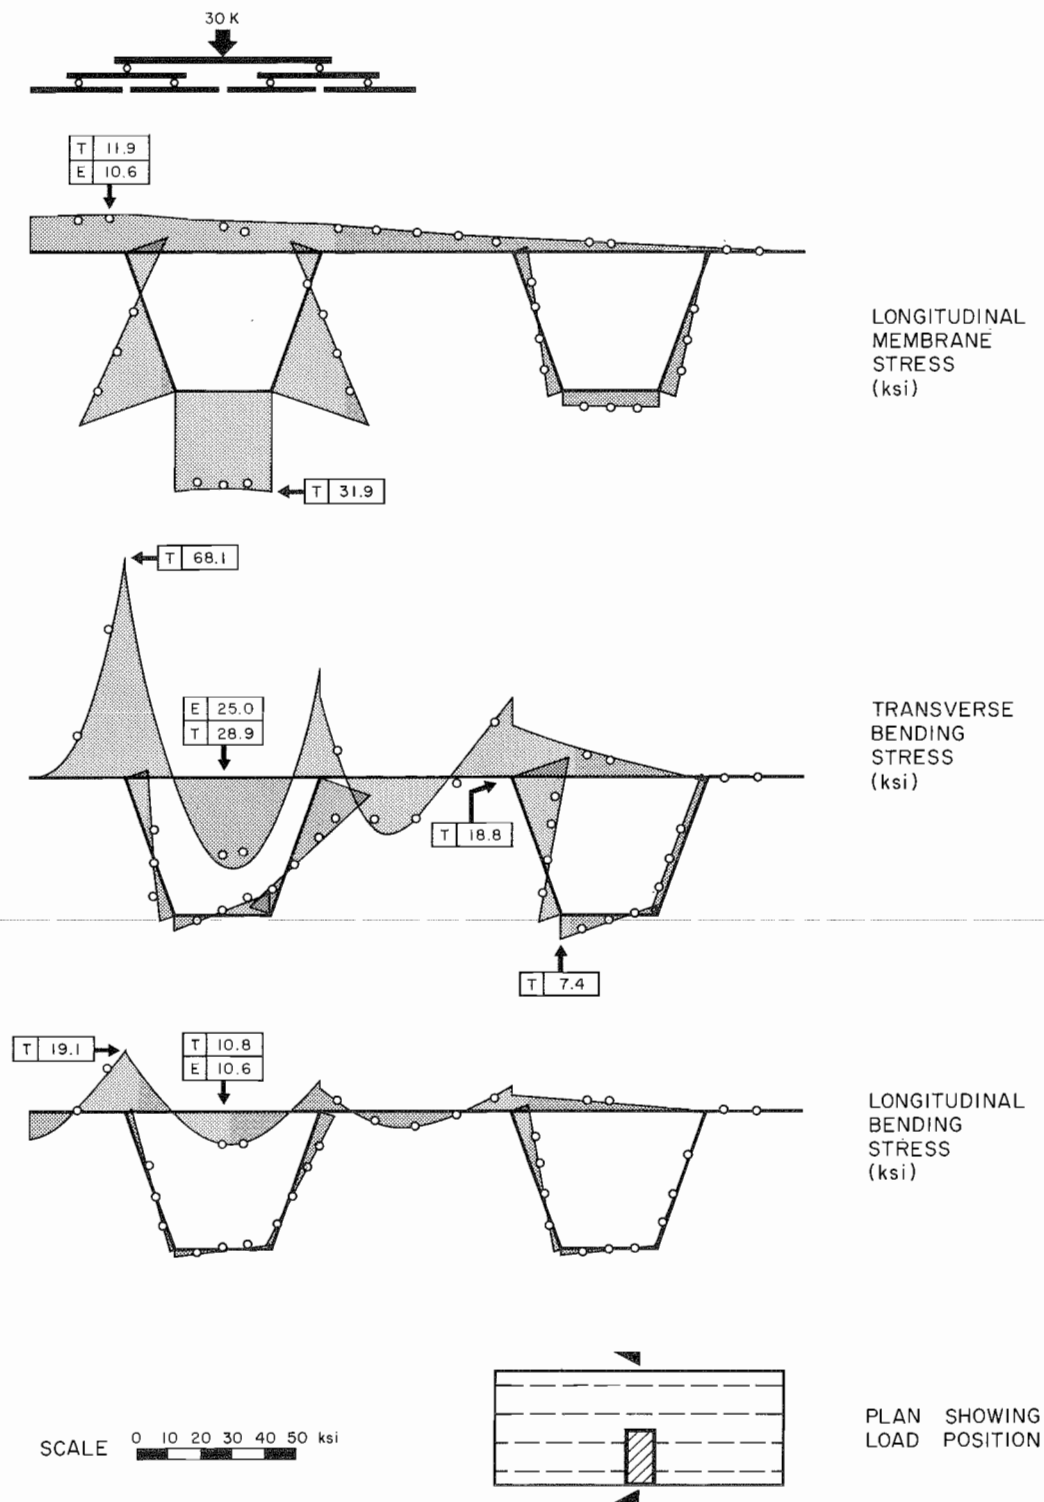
STRESSES IN DECK PLATE AND RIB WALLS, MODEL OF BRIDGE I.
